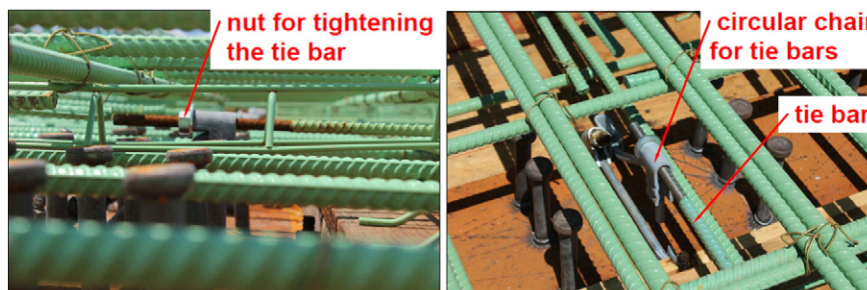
Dayton's steel hangers used to attach the transverse tie bars with the exterior girders.
